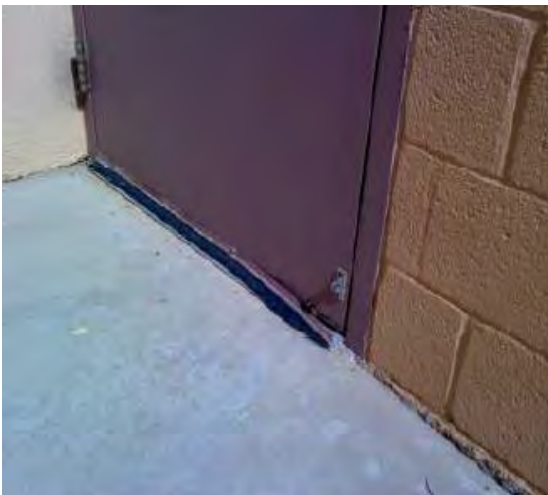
Building envelope issues at Salvador Perez Swimming Pool
